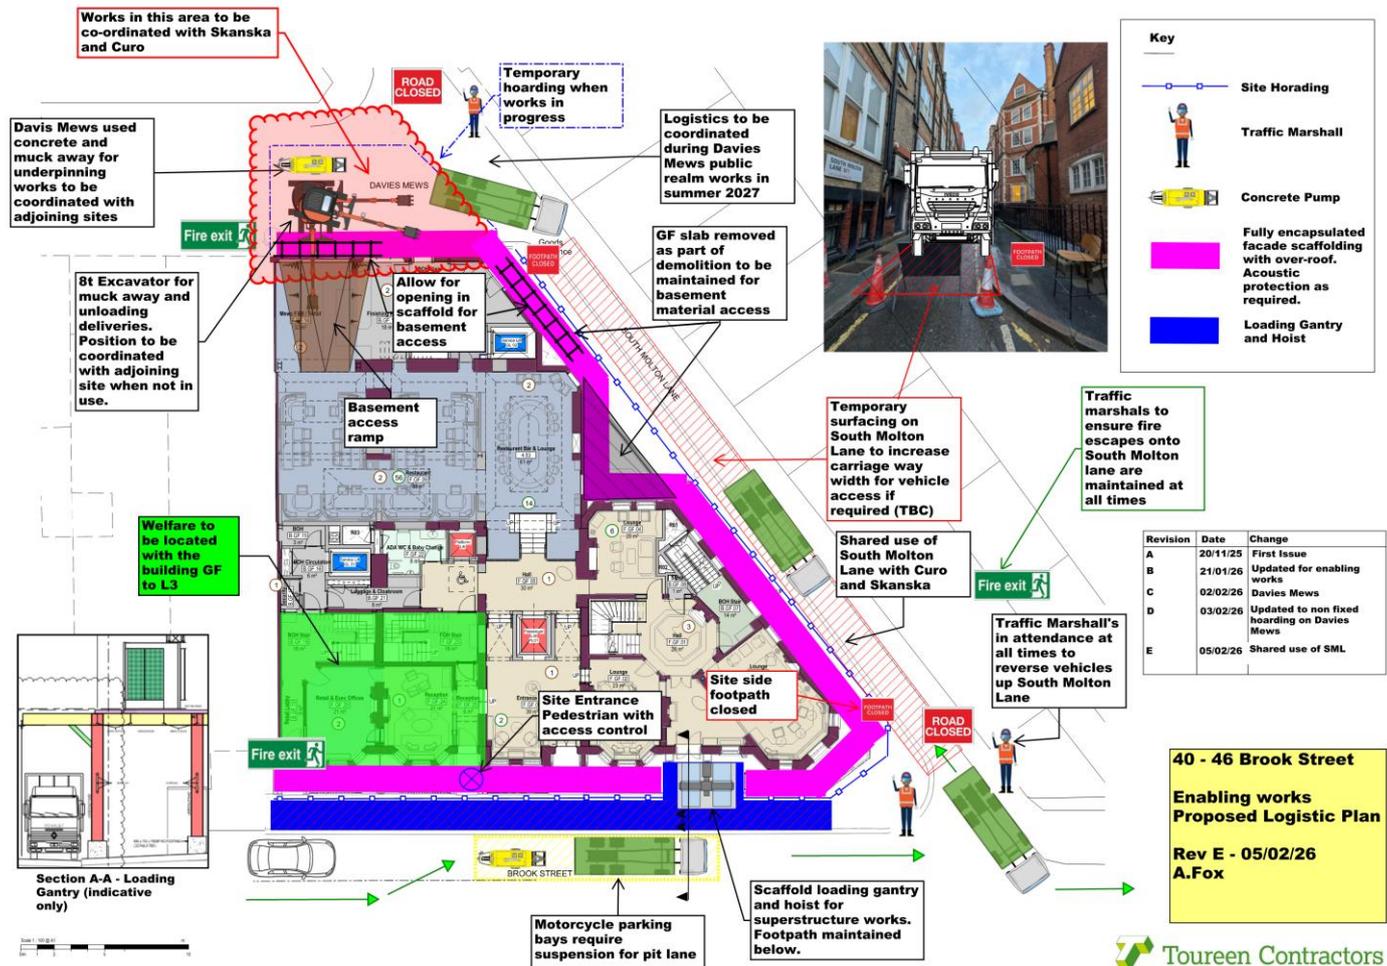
Enabling Works Proposed Site Layout/Logistics Plan
